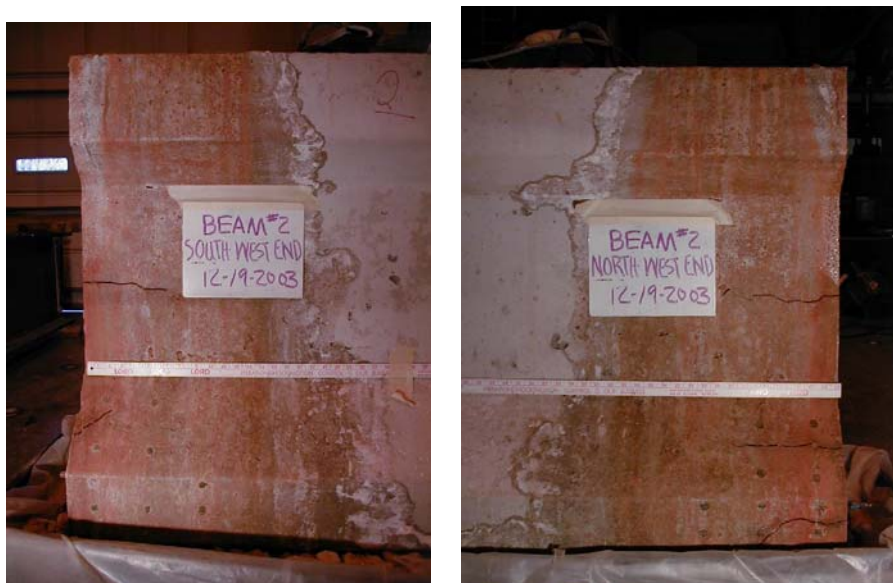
Beam End 2A: Southwest Face (left), Northwest Face (right) (After 18 months)
